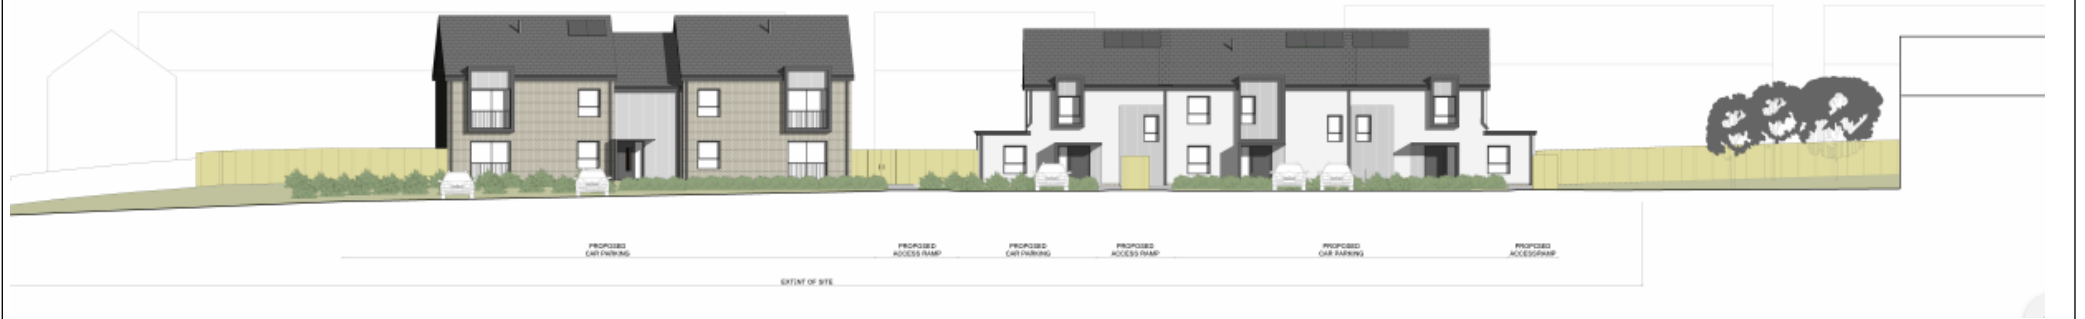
Site 2 - Proposed Street Elevation - Brownhill Place
